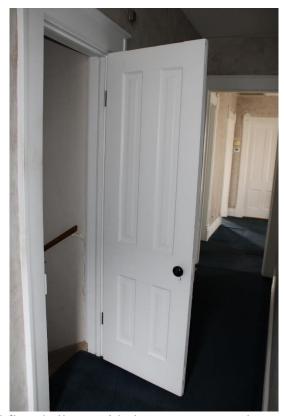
Second floor hallway with doorway to secondary staircase on the left.
